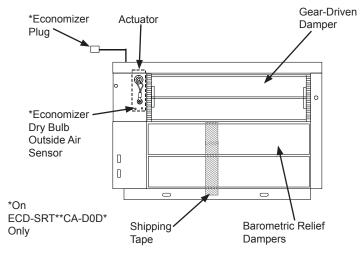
Economizer Component Locations — (Small Cabinet Economizer Shown)
